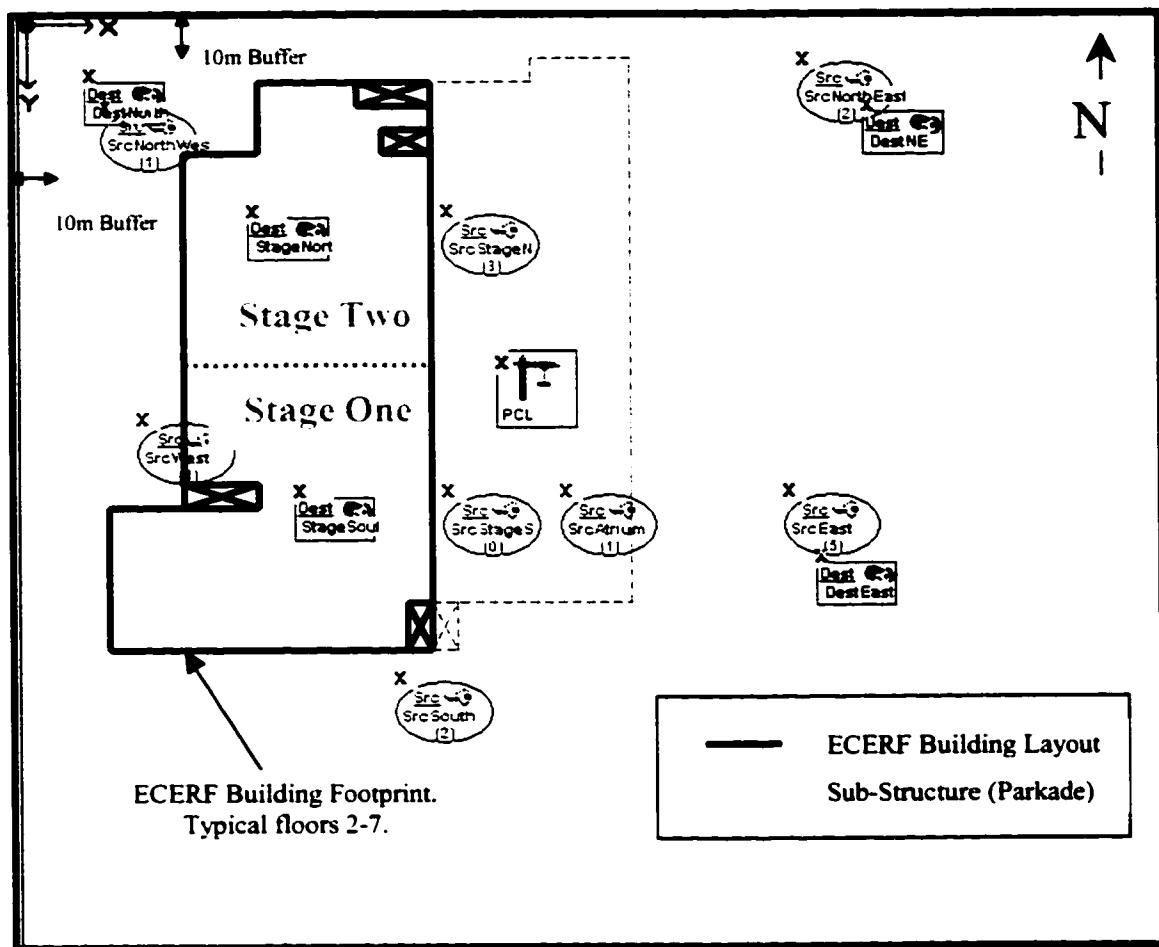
ECERF Building Floor Footprint and Model Elements (typical floors 2-7)
